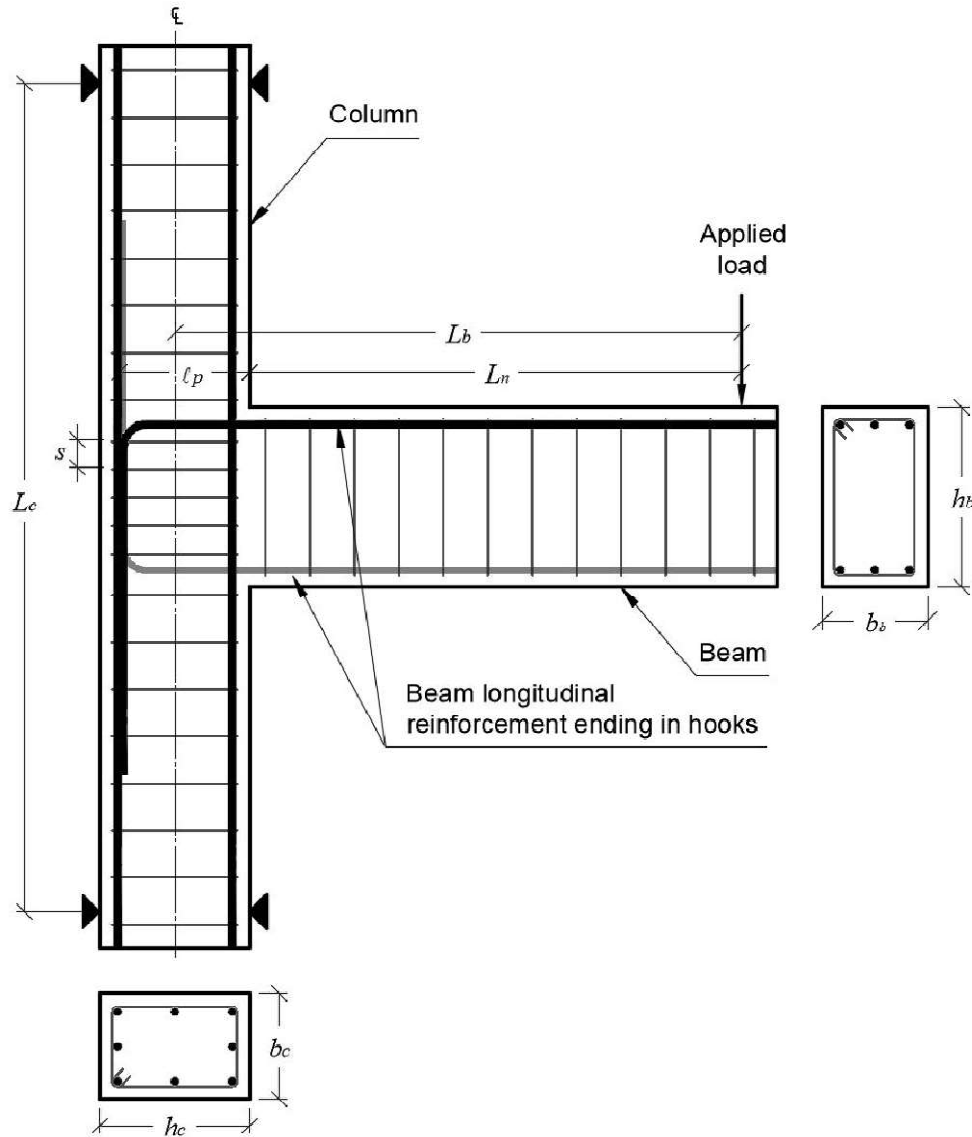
Schematic of specimens in database (elevation and cross-sections)
